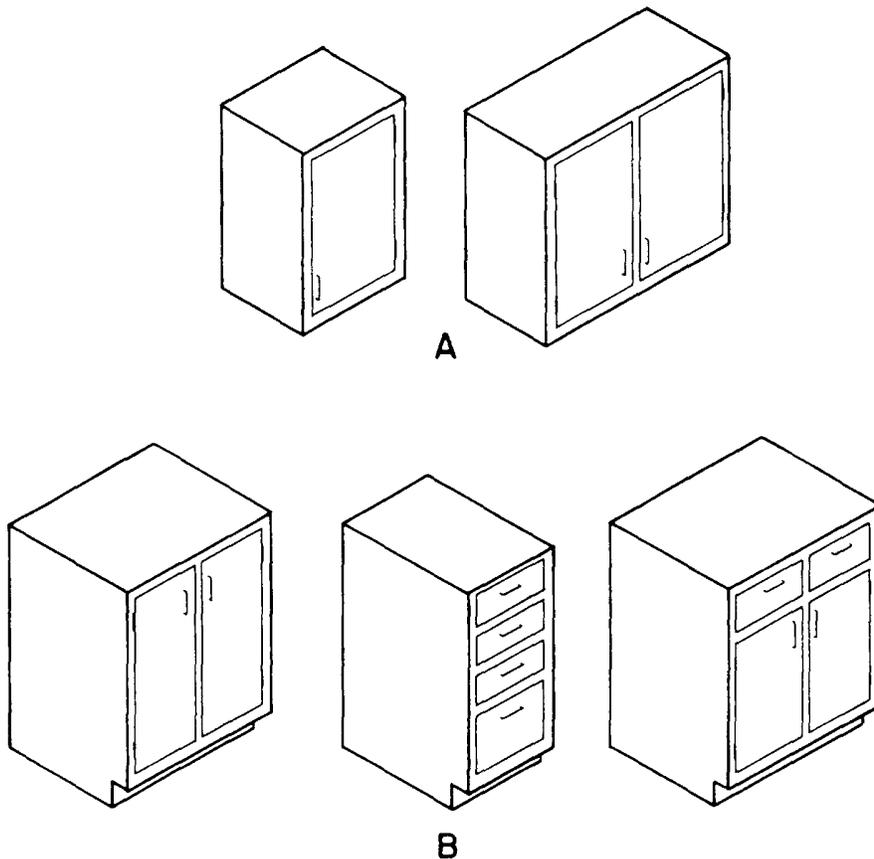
Typical kitchen cabinets: wall (view A) and base (view B).
